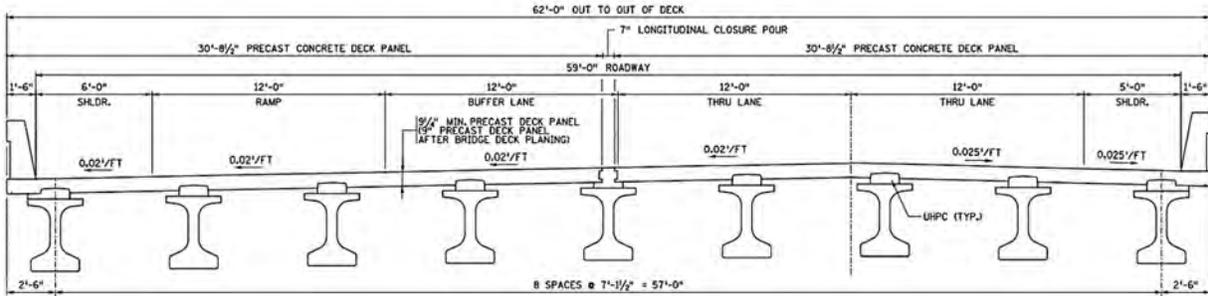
Typical cross section with crowned precast deck panel for fewer longitudinal joints. Very limited deck surface penetrations were desired and hidden pockets were utilized at each beam line.
